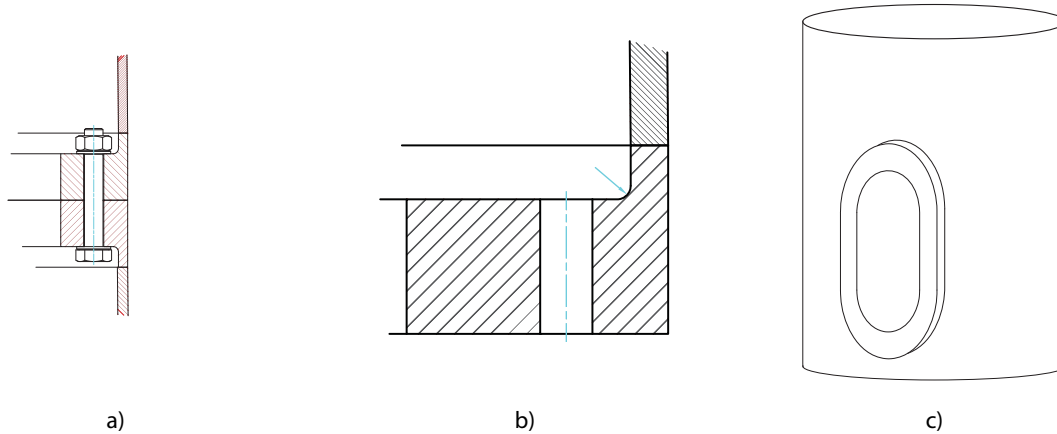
a) Bolted connection between flanges. b) Welded connection between cylindrical sheet and the flange. c) Door opening at the bottom of the tower
